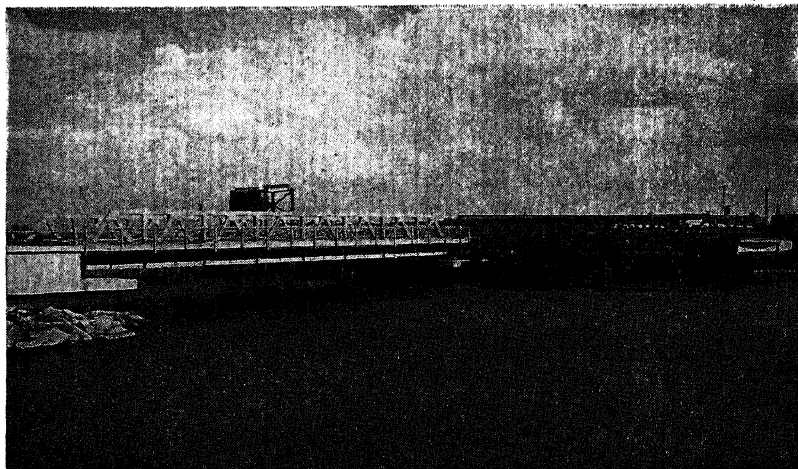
Completely arc welded highway bridge consisting of two approach spans 192 feet long and a 160-foot center swing span.
